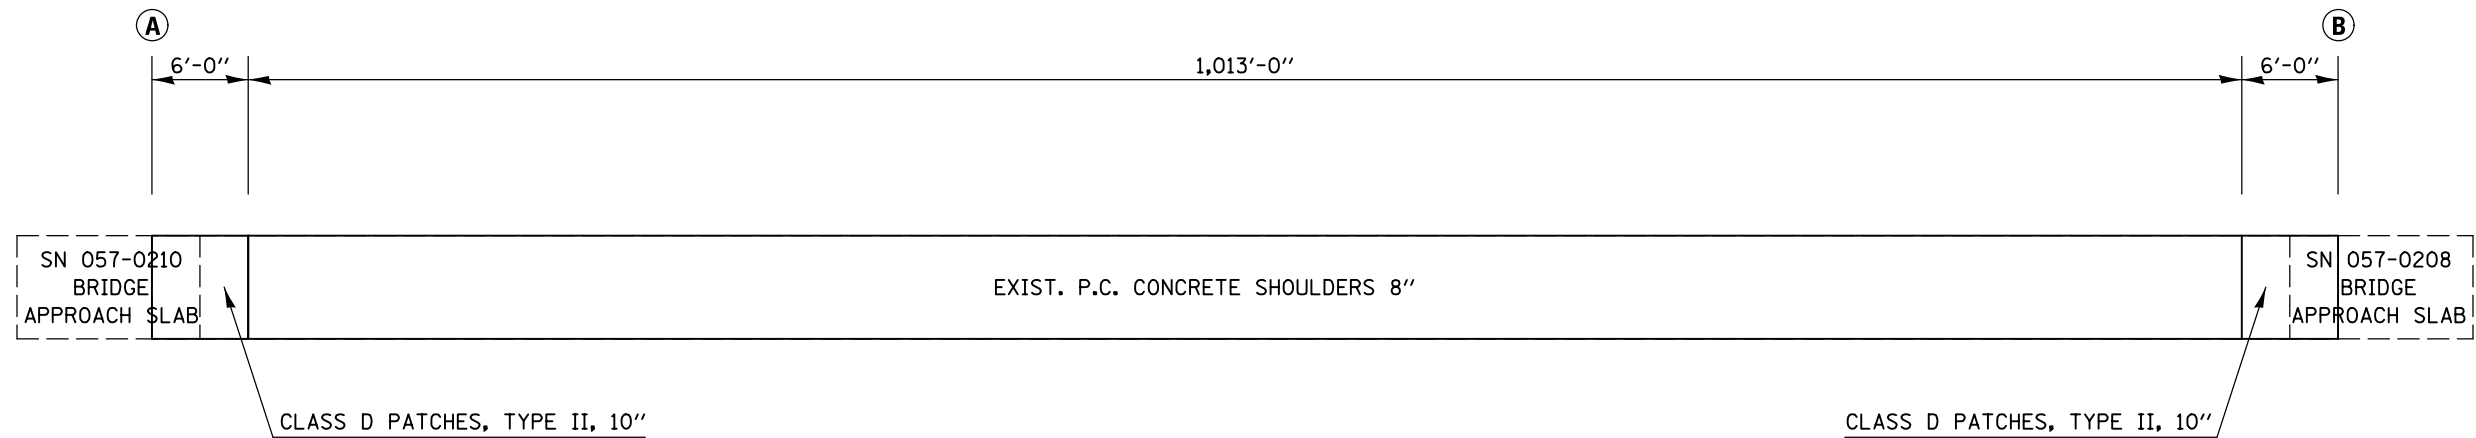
BUTT JOINTS AND PAVING TRANSITIONS
